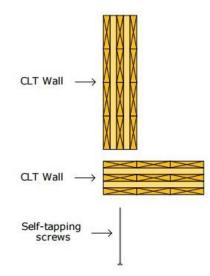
Wall-to-Wall Example (Karavabeyli and Douglas, 2013)
